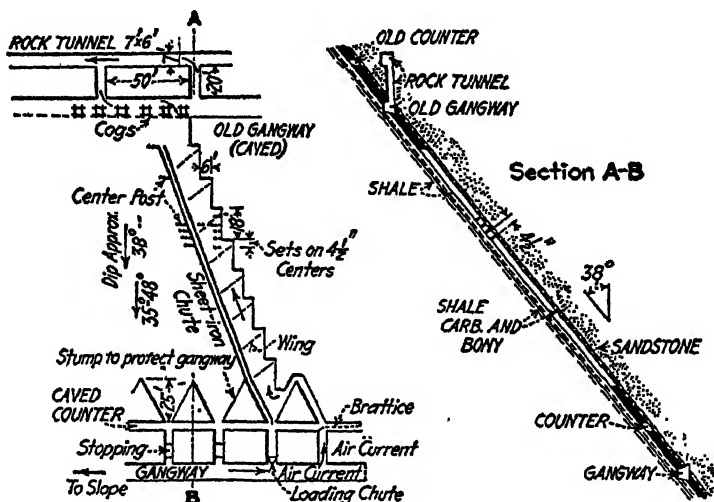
PLAN AND SECTION OF MINE WORKINGS, MILLER MINE.
